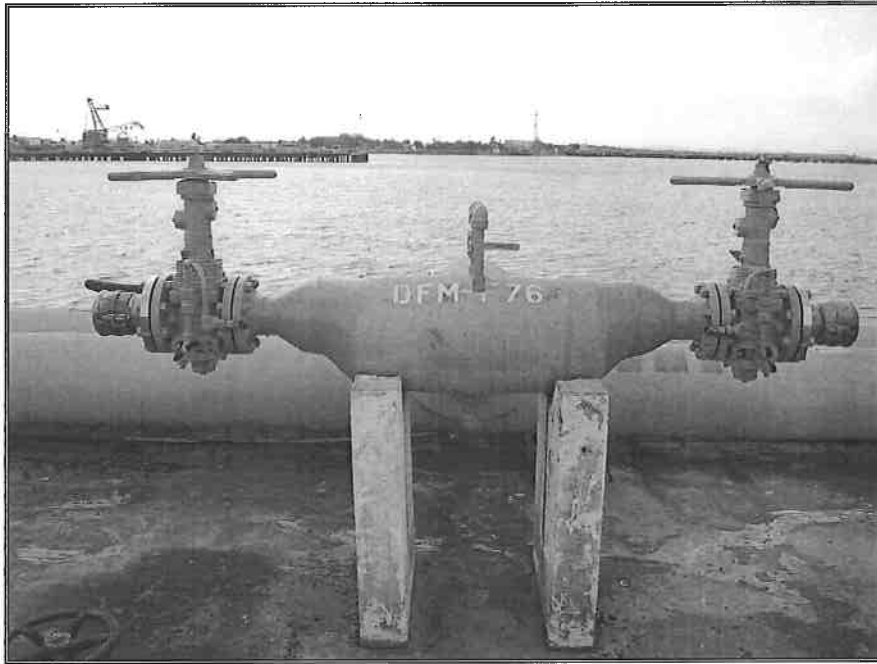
Test No. 1 DFM Valves FP1-102 and FP1-103
